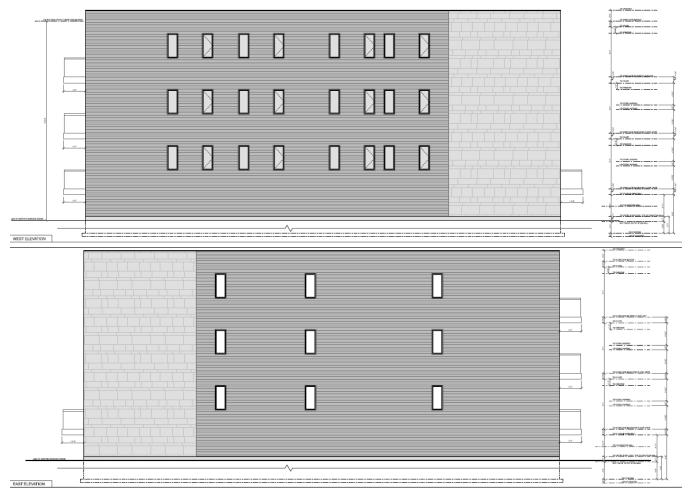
West (top) and East (bottom) Elevations of proposed building.
